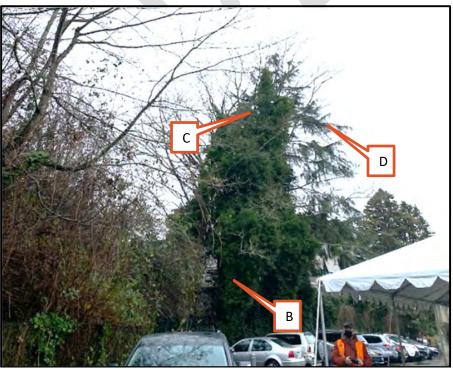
View looking towards the rockeries in the southeast section of the site.
